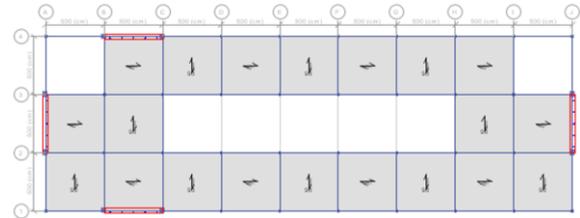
Four-story plan of model No. 3 with change in shear wall thickness.
